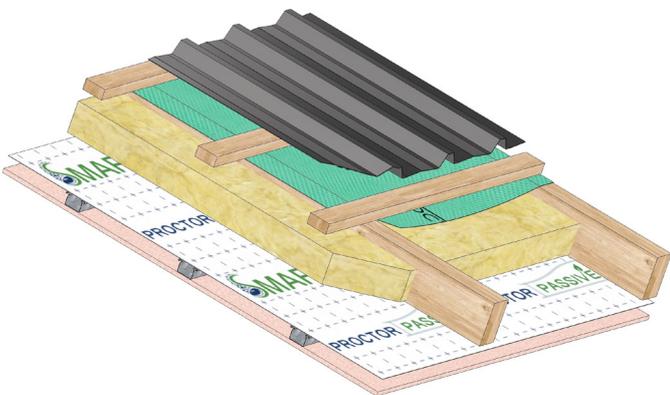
Conventional method for a pitched roof where the sarking is installed draped over and perpendicular to the roof truss/rafters to permit safe drainage under the roof batten. The ProctorVent DB-FR drainage batten is not required to be used in such installations.
